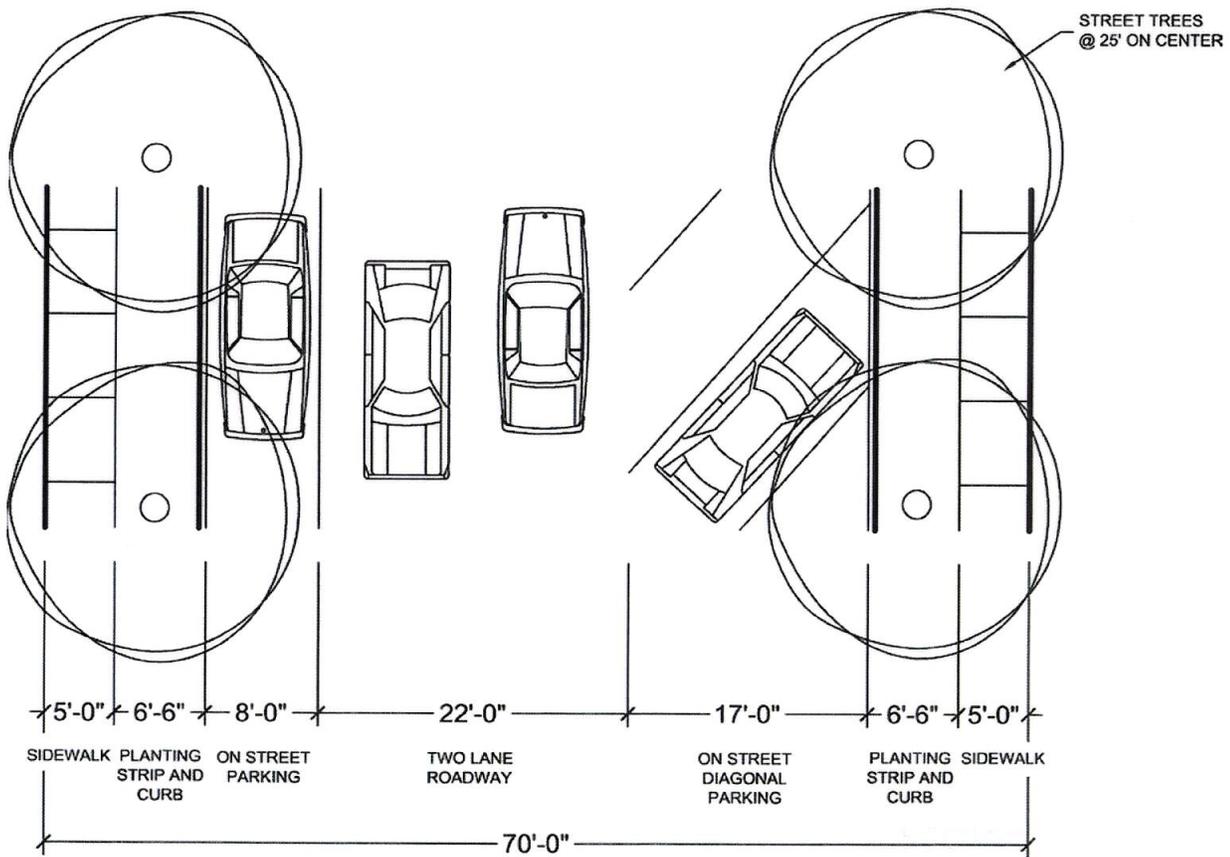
New Diagonal Parking Roadway Reconfiguration
